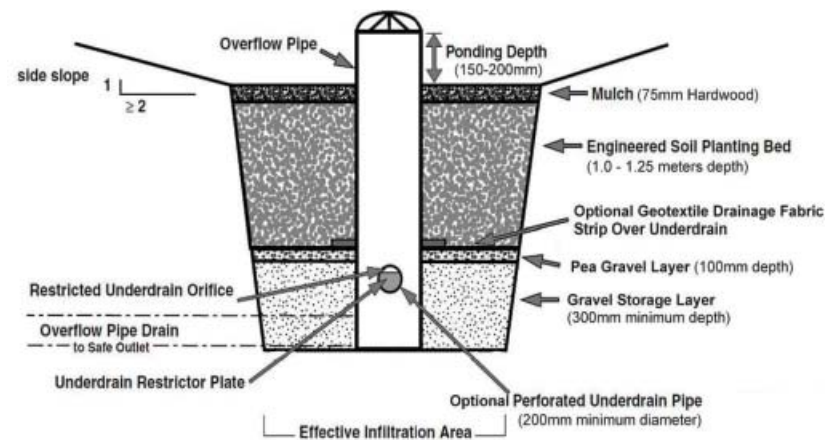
A cross-section of an overflow pipe. Note: Each material and depth of installation is specified. (Source: Aquafor Beech)
